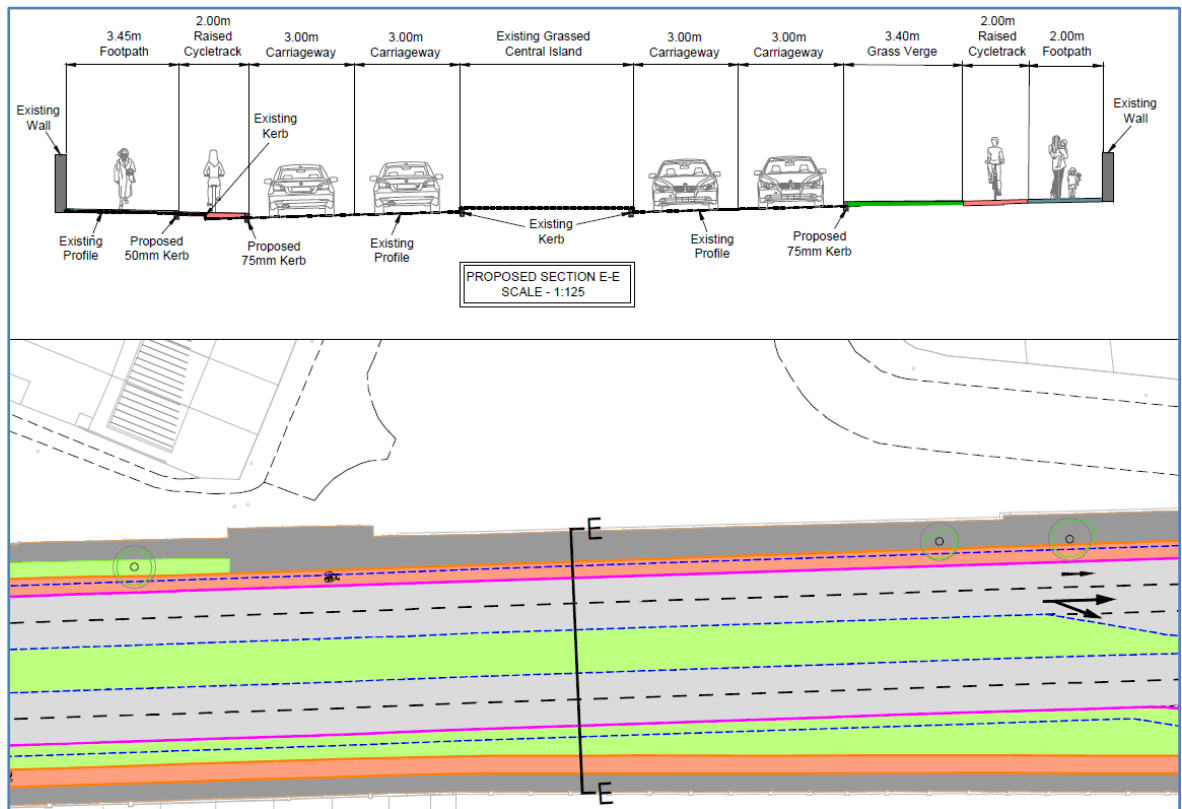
Extract from Drawing No. 19413-BT-00-XX-DR-Z-00127 (Proposed Layout Sheet 2 of 3)
